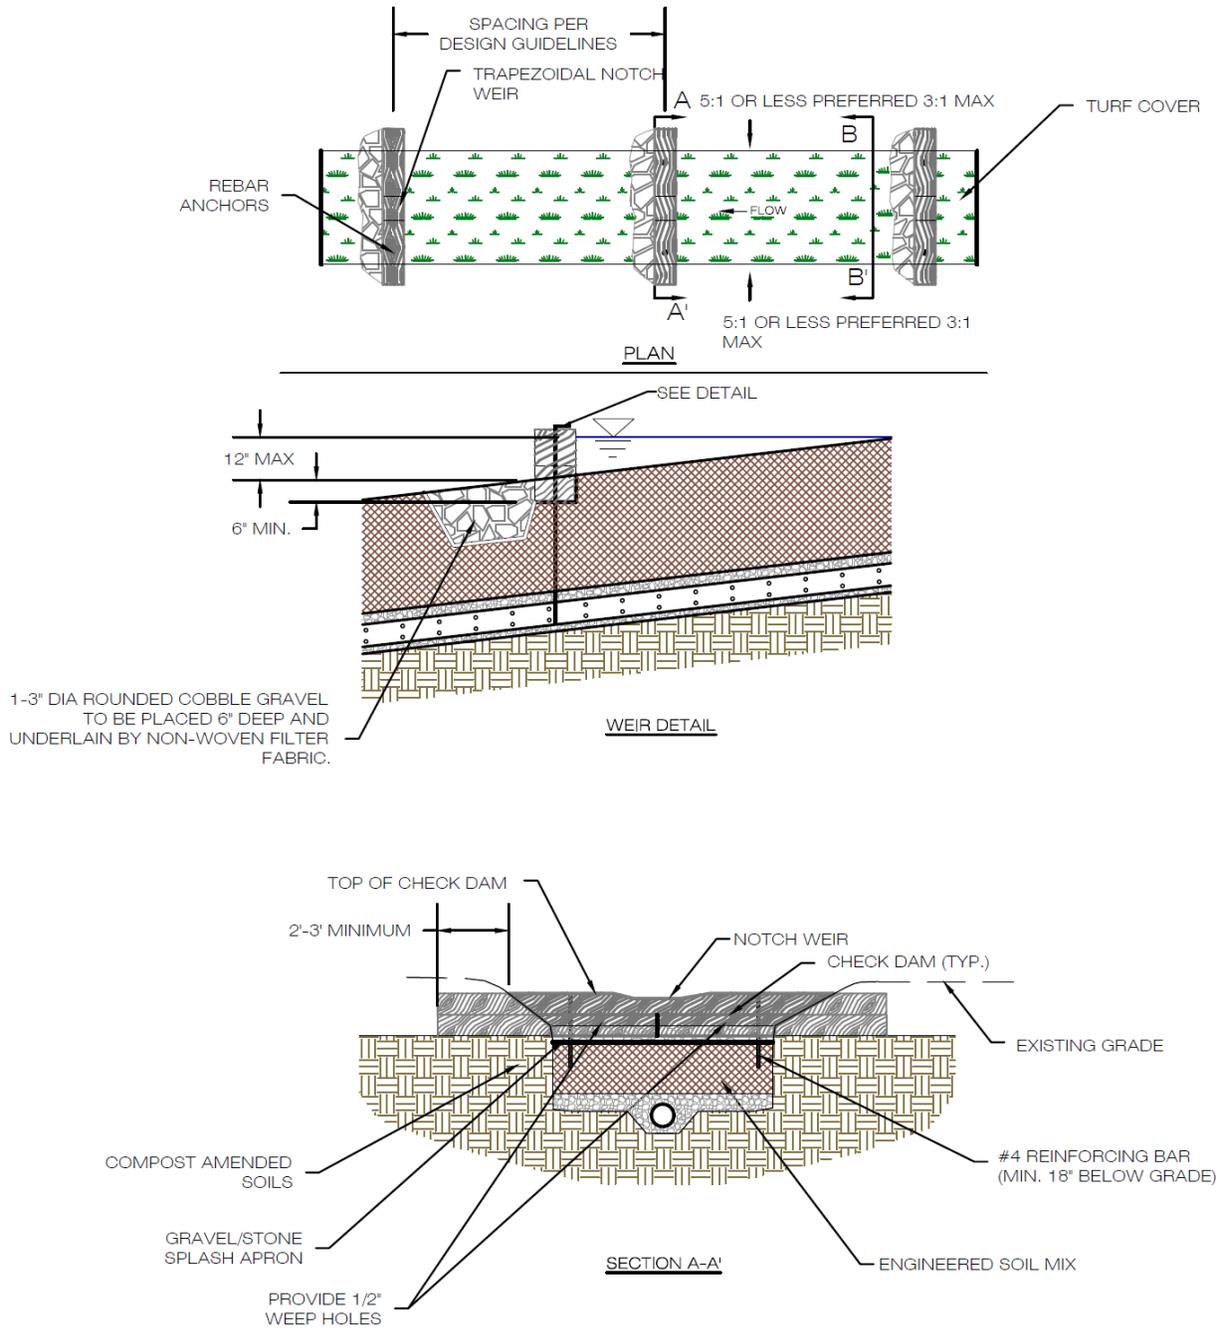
Typical Details for Level 1 and 2 Dry Swales
